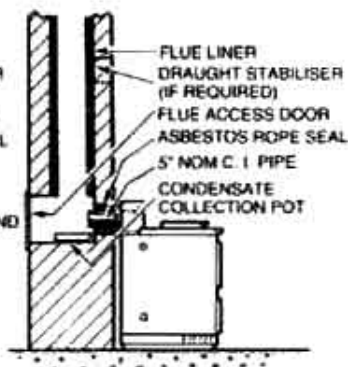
PLAIN WALL USING REAR CONNECTION
